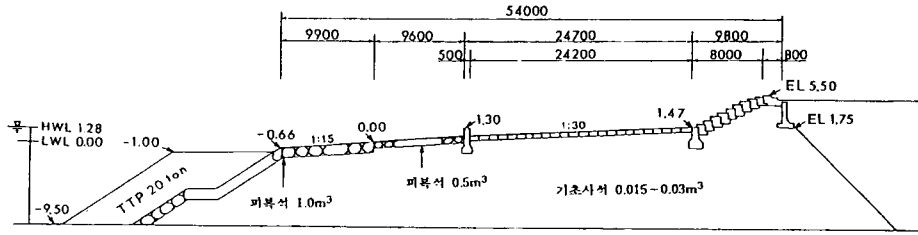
Cross-section of the mild slope seawall (unit : mm).
